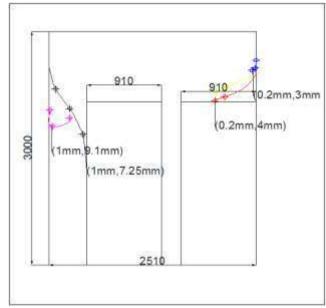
Crack profile for Kitchen Wall 4 (Block G, C & B)
